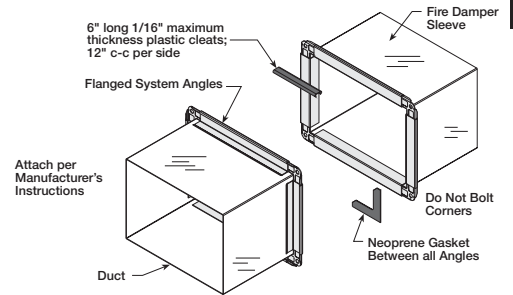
Breakaway Connections PROPRIETARY FLANGED SYSTEM BREAKAWAY CONNECTIONS
